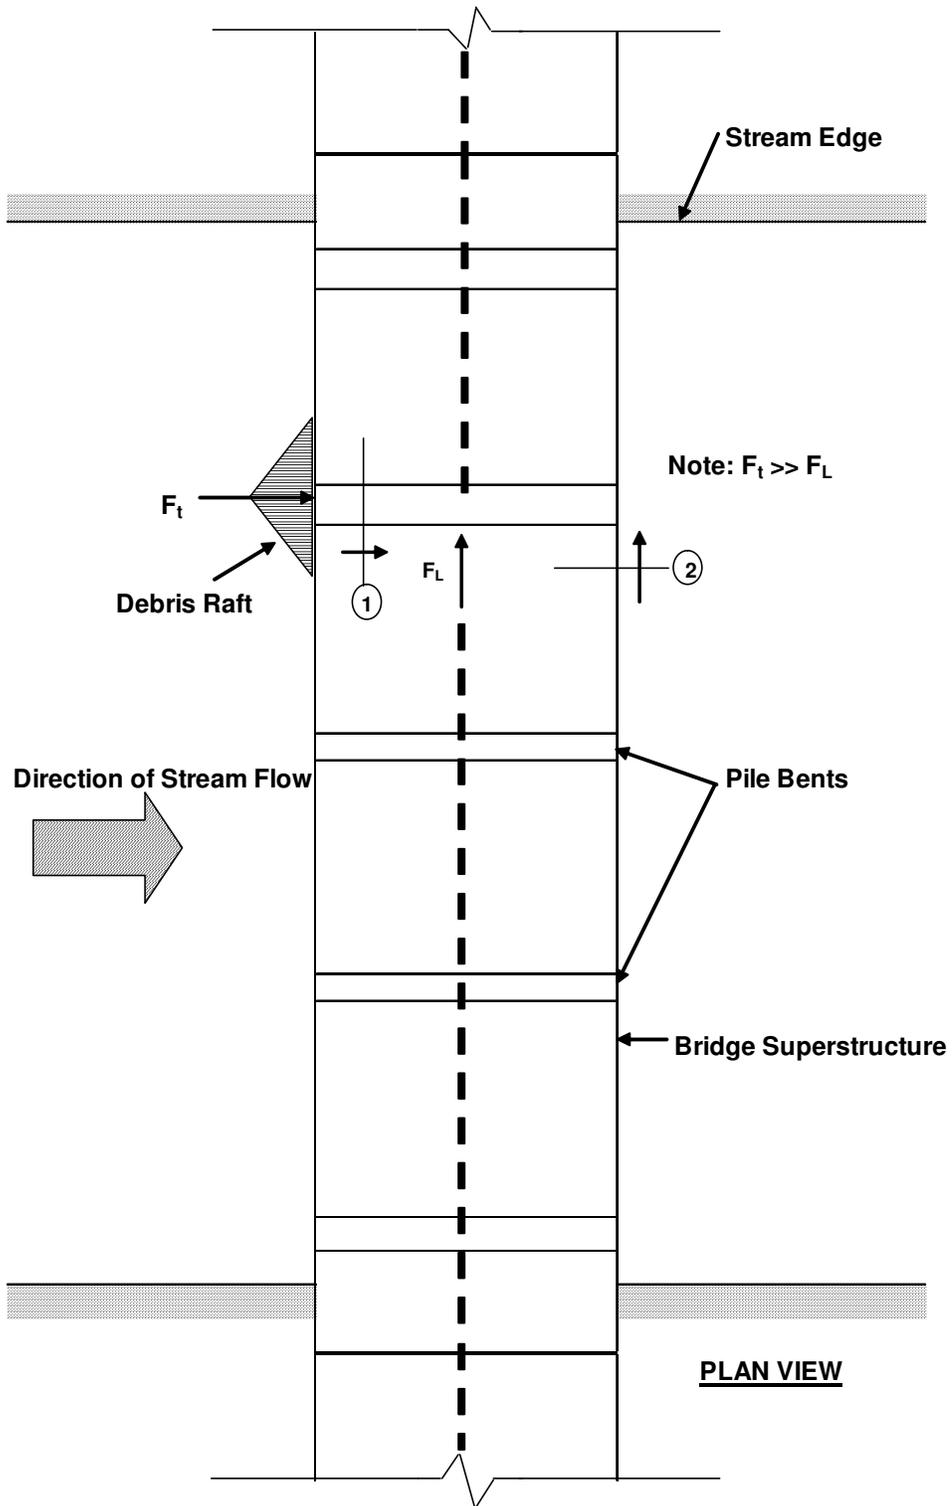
Typical Pile Bent Supported Bridge over a Stream
